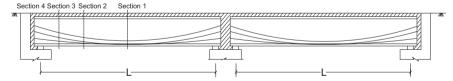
Two span continuous post-tensioned I-girder bridge.
